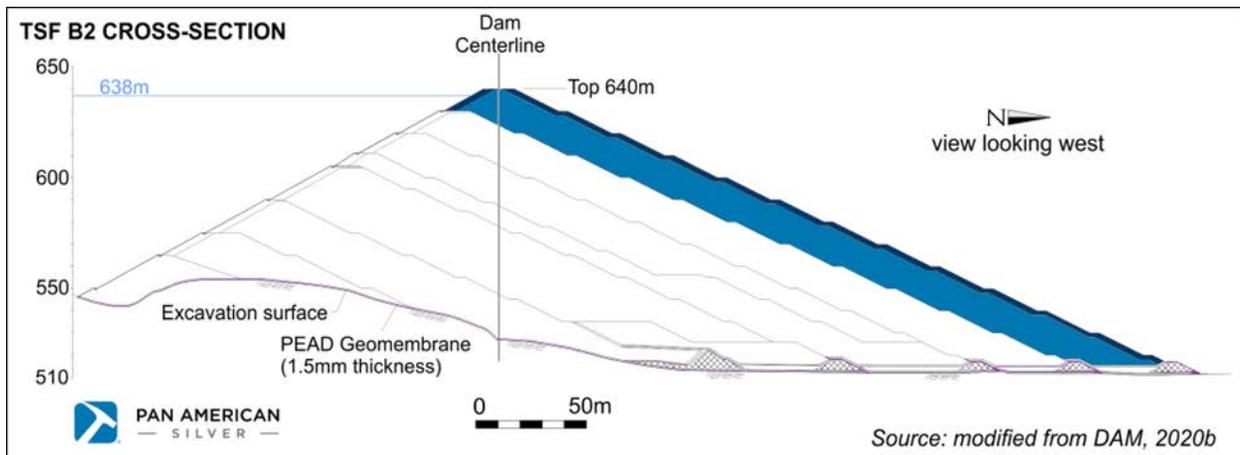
Cross-section of TSF B2 dam at final elevation
